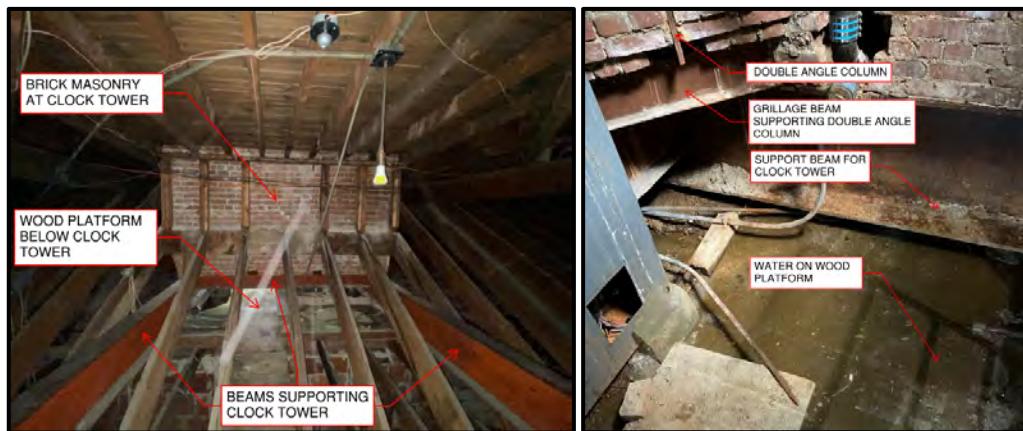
On left, a photo taken from the attic space showing the beams supporting the clock tower. The deep girder on the far side of the clock tower is not visible here. On right, water is visible on the wood platform.
